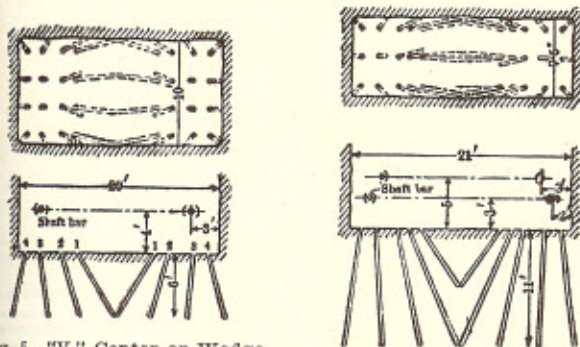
"V," Center or Wedge Cut for Shaft Sinking
